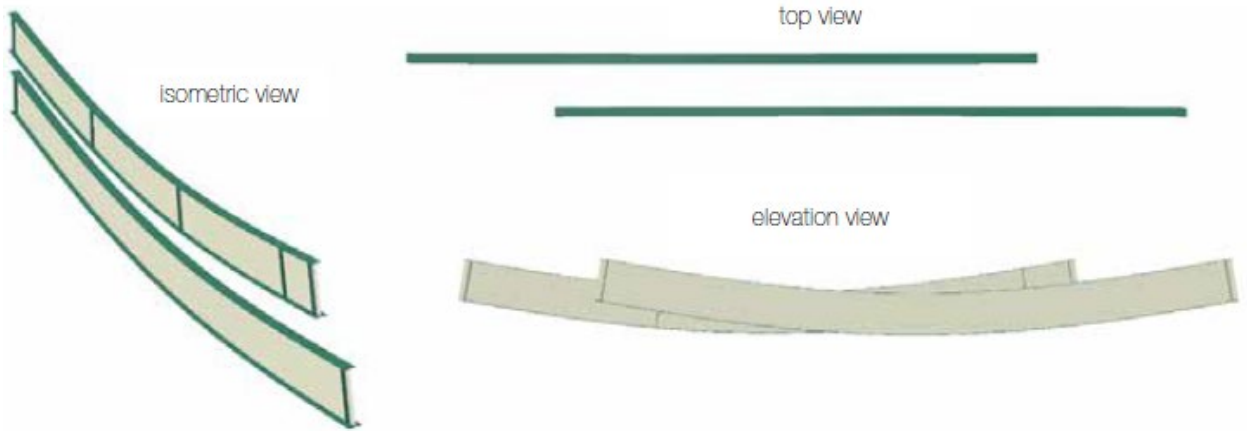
Girder deflections for two simple-span I-girders on parallel skewed supports, subjected steel dead load prior to connecting the cross-frames, from NSBA (2016).
